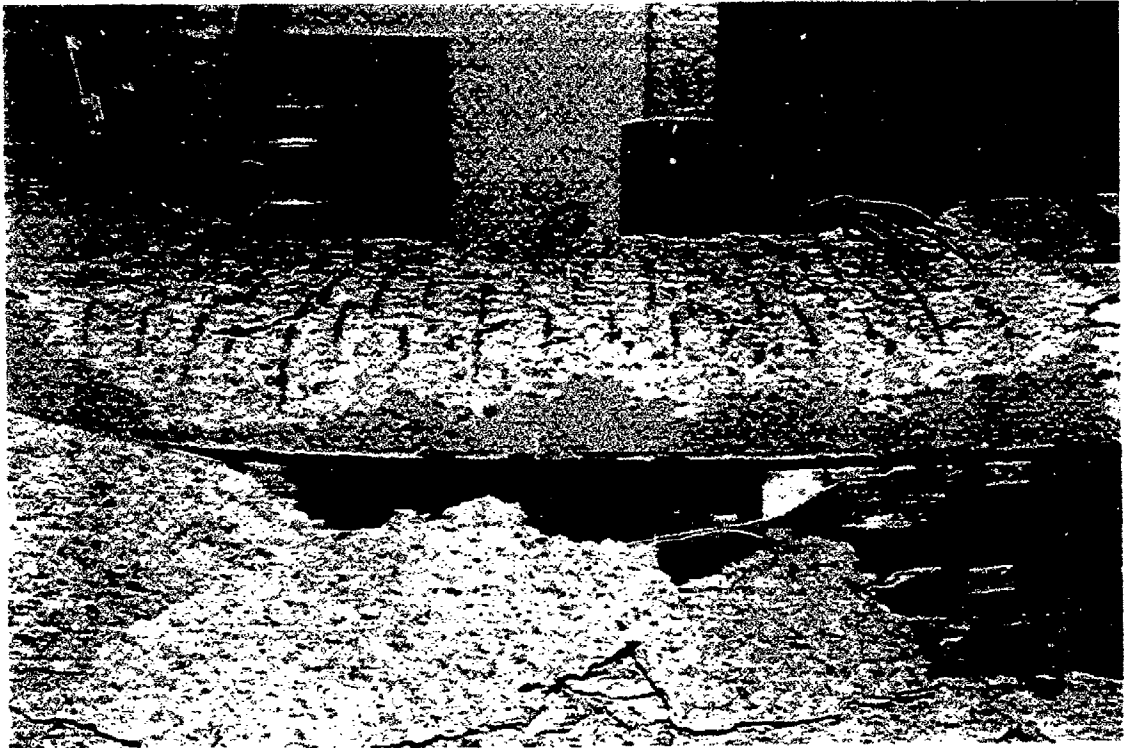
Confined Concrete Core with Layer of Spalled Concrete -
